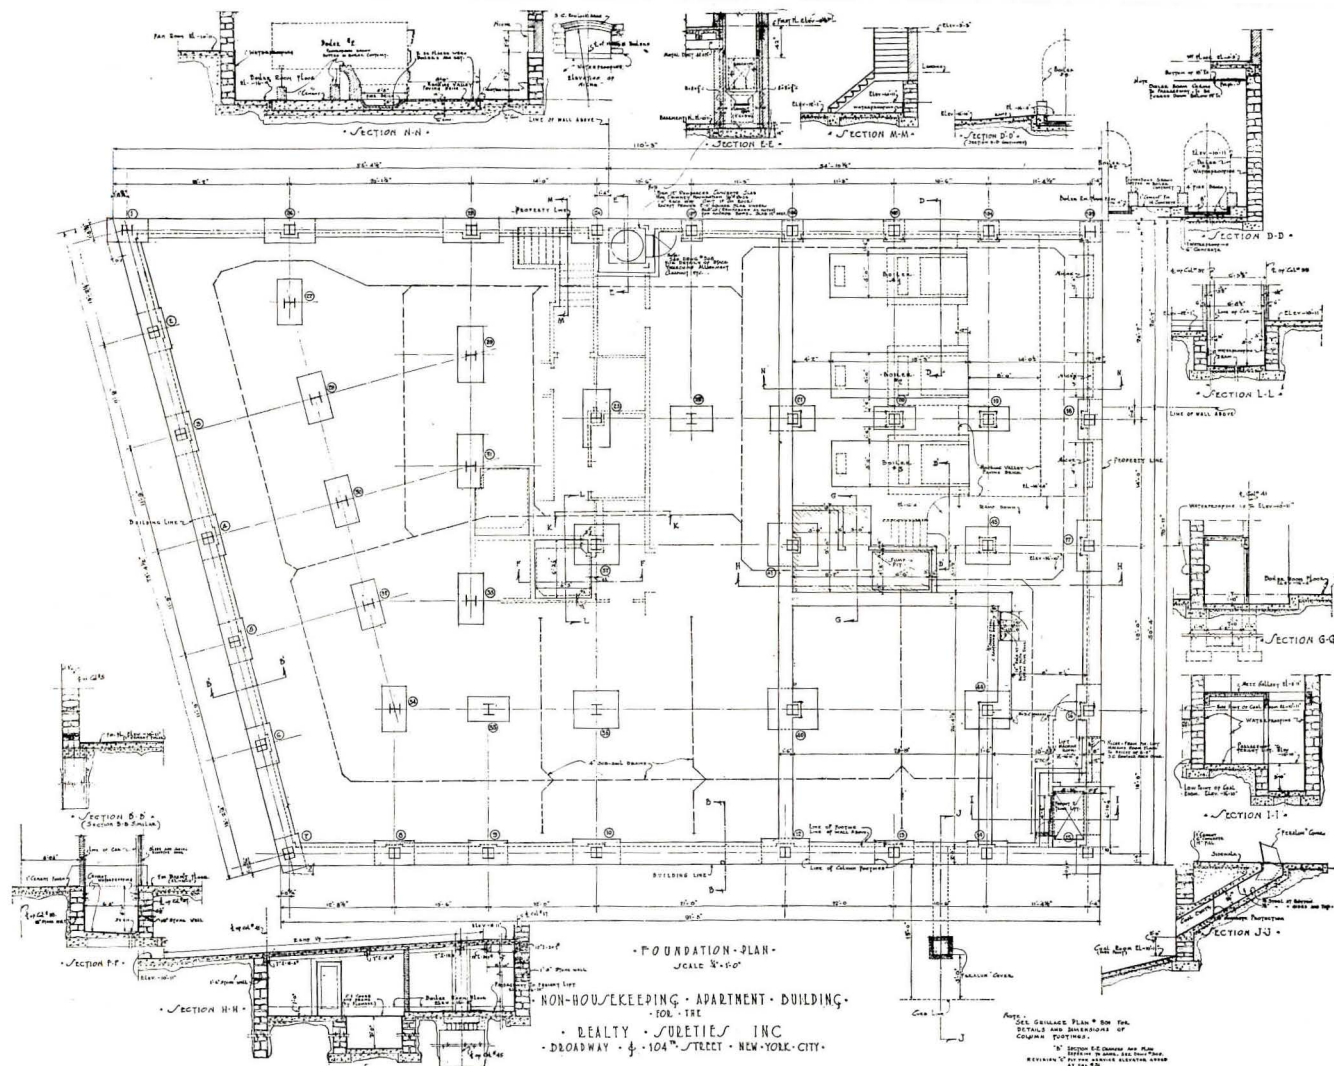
Foundation Plan, Non-housekeeping Apartment Building for Realty Sureties, Inc., New York City. Carrere & Hastings, Architects. Shreve, Lamb & Blake, Associated.
